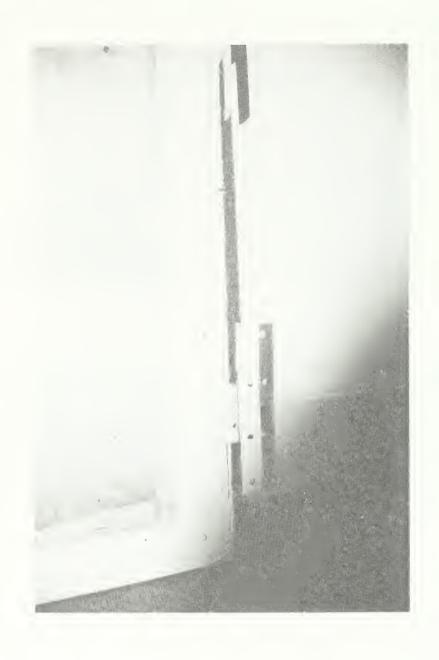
South attic room (Room 301), sash from window W302, detail showing wrought H hinges attached with wrought nails.
